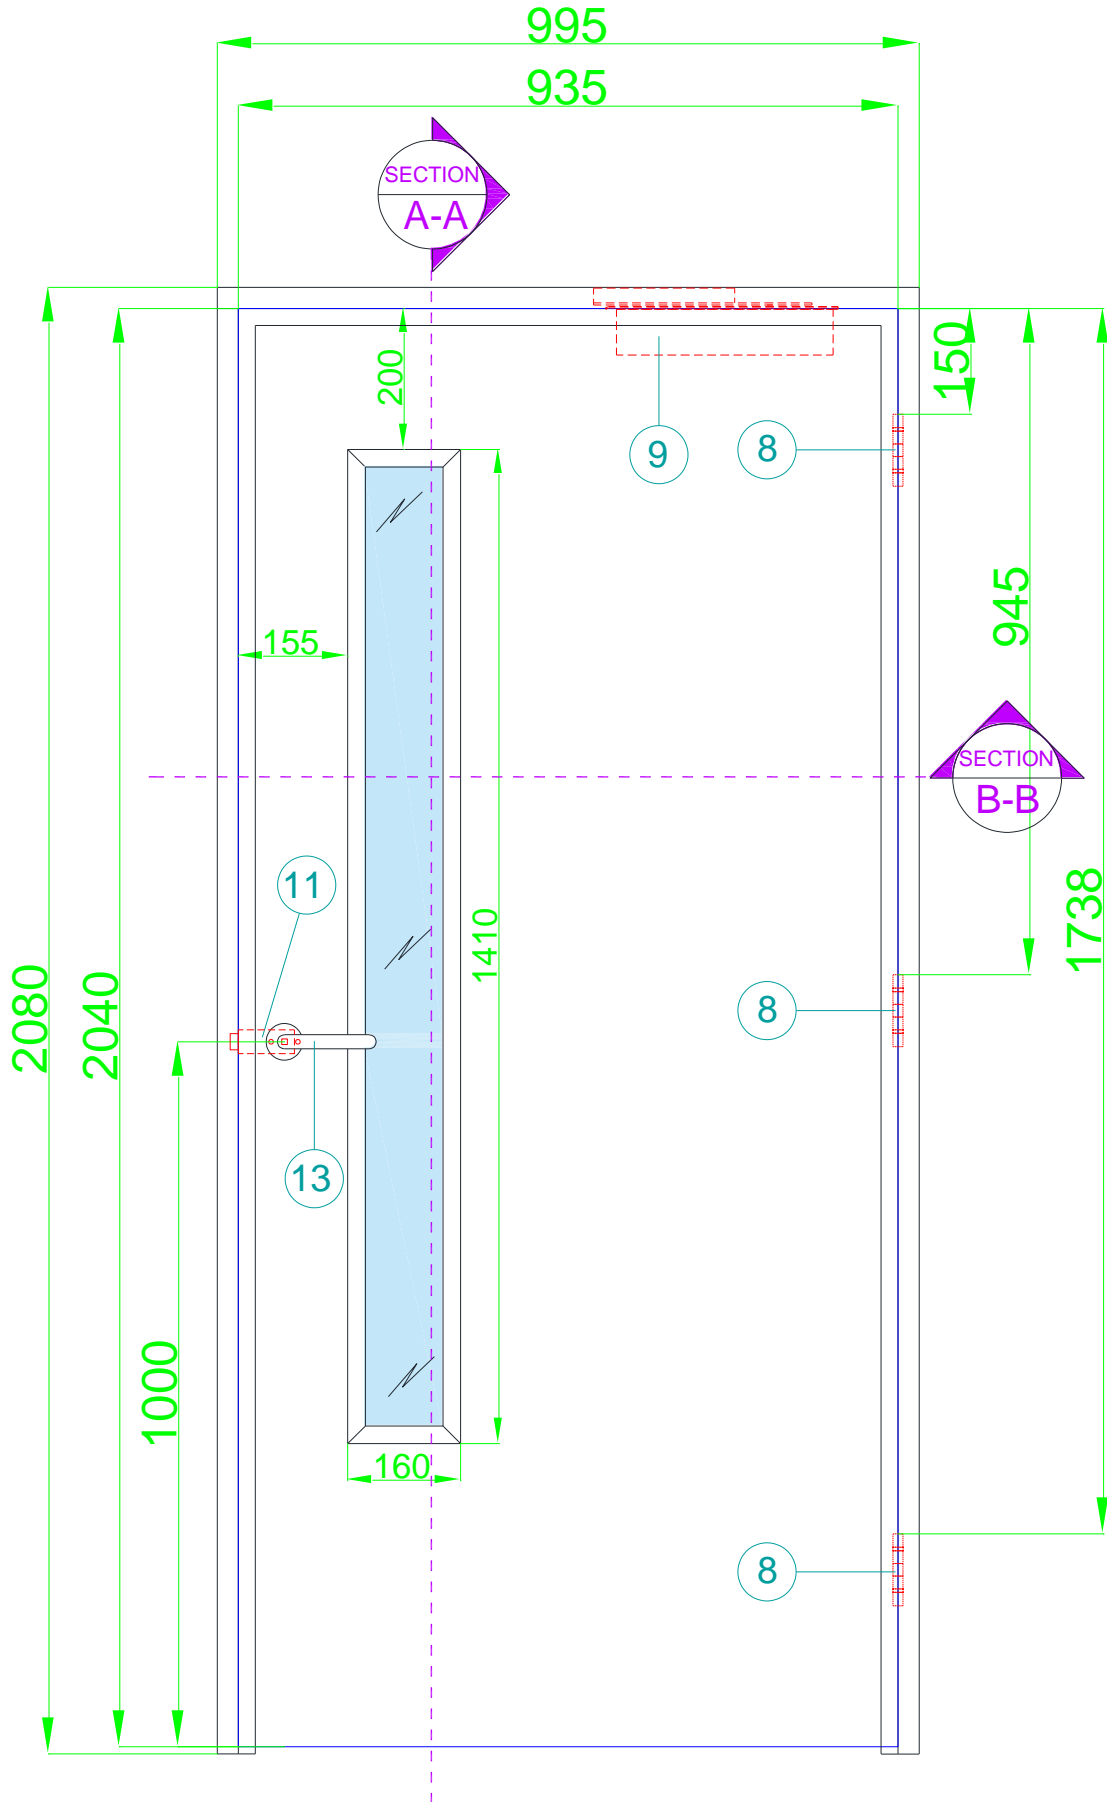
Doorset A - Elevation view of test specimen (unexposed side)
